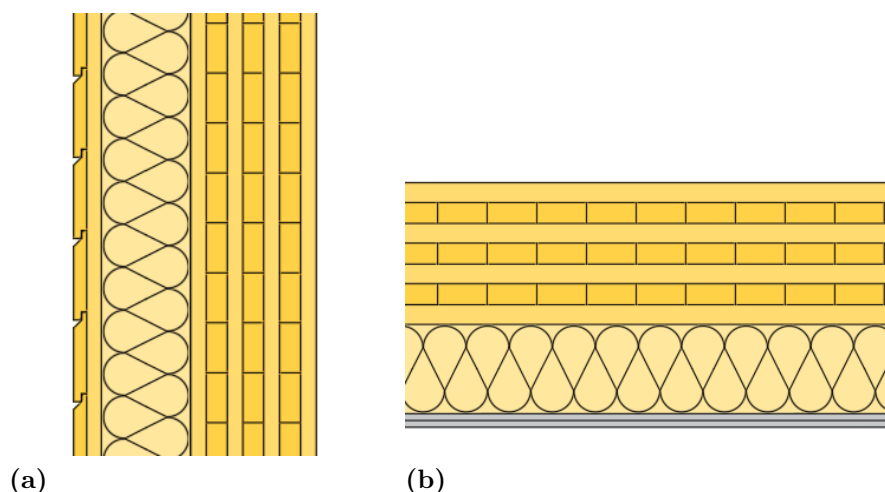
Illustrated designs of (a) External wall (b) Ceiling.
